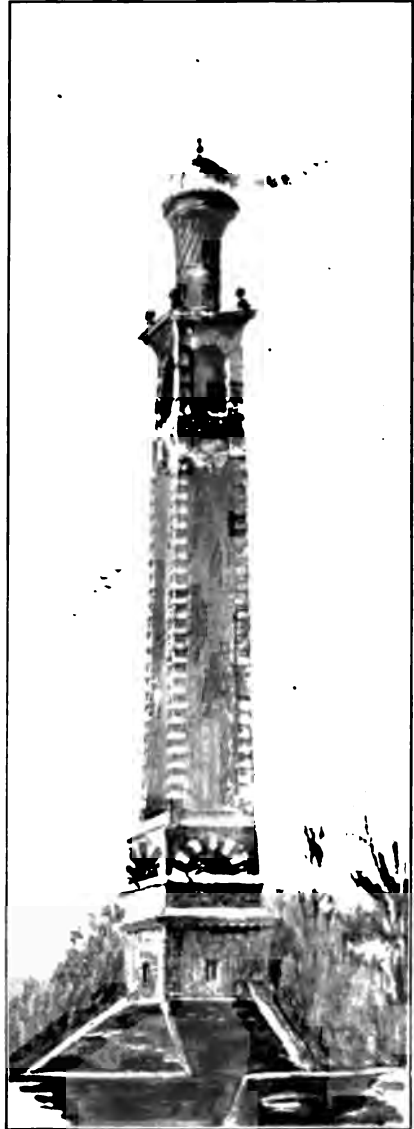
Chimney of the Electric Power Plant in Munich (*from a sketch, and by courtesy of Mr. C. Stanley Peach, London*).
